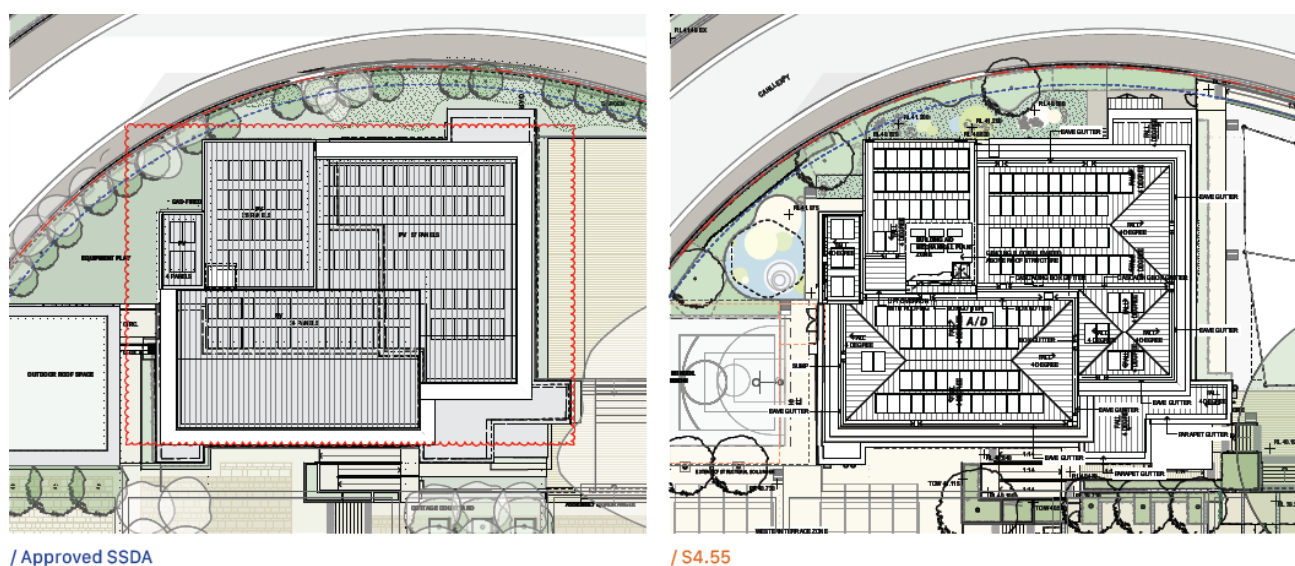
Plan showing changes to PV cell layout and addition of mechanical plant on the roof of Buildings A and D
